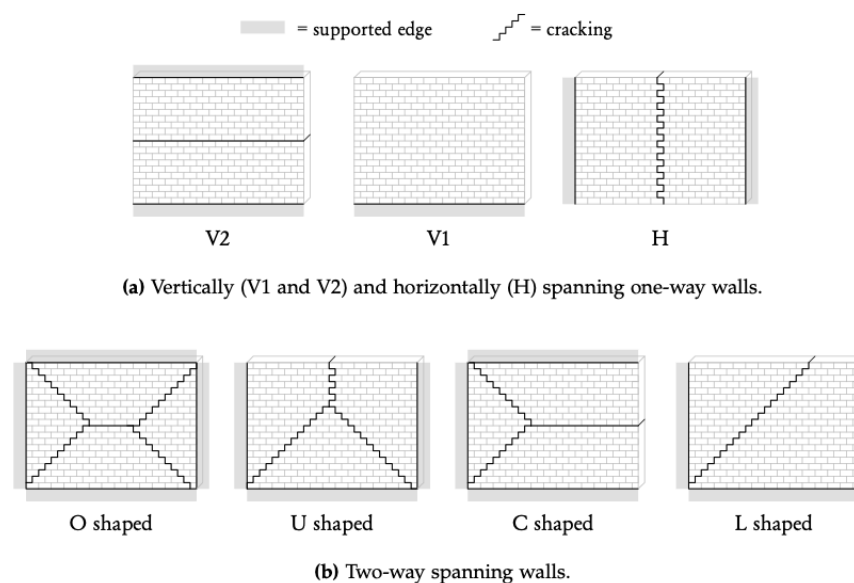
Expected URM Crack Patterns Based on Wall Span Direction [10]
